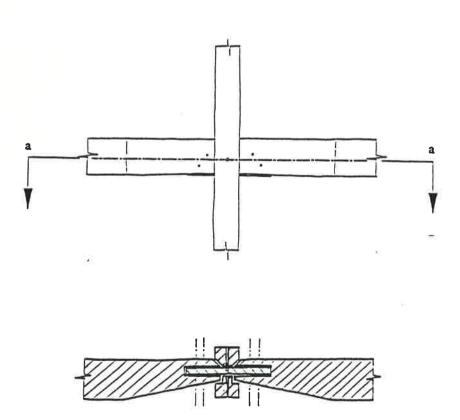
Stable ceiling, north end, with long and short chamfers. Fig.6b Stable ceiling, south end, with replaced joists.
